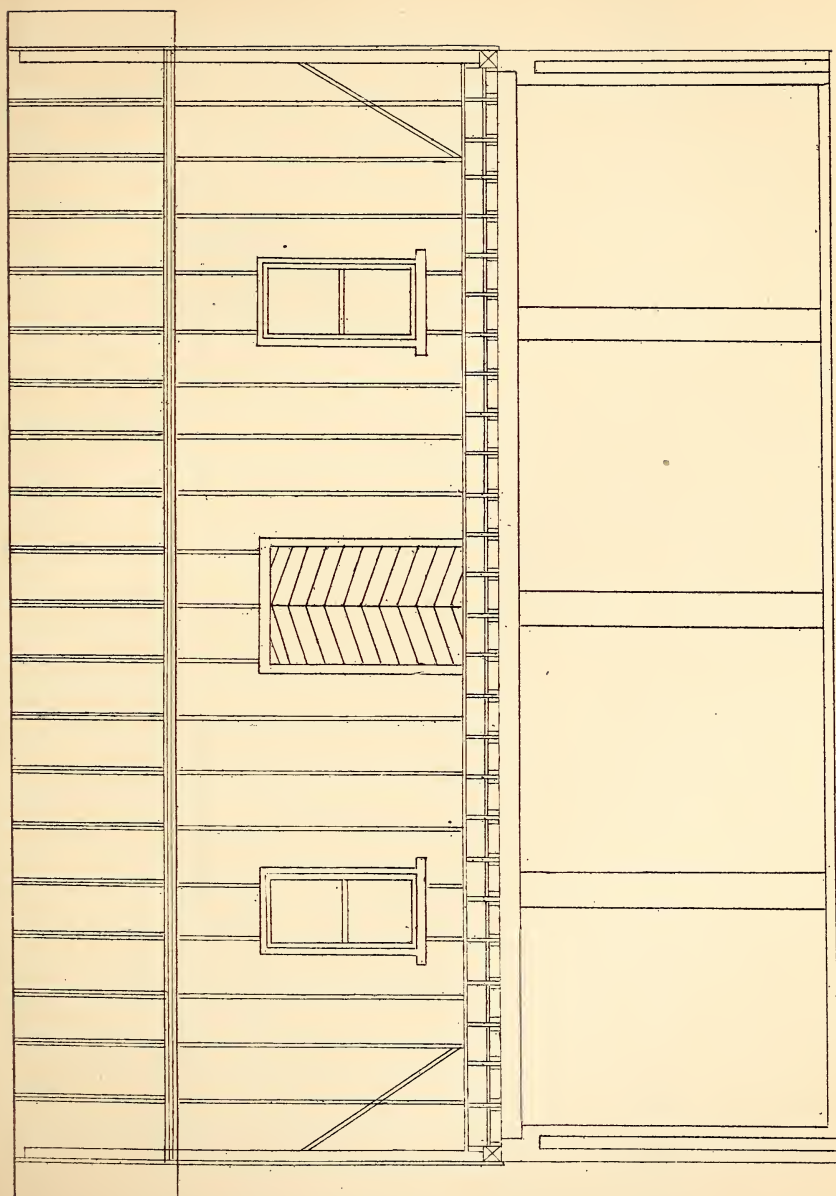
South elevation of Gold Medal Orchards' apple storage house.
